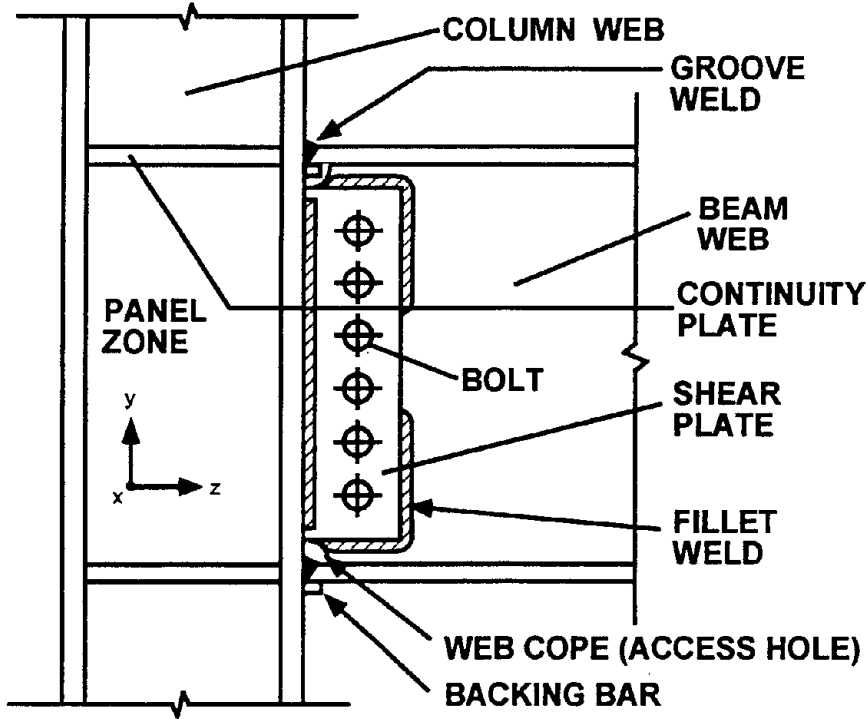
A typical welded beam-to-column connection.
